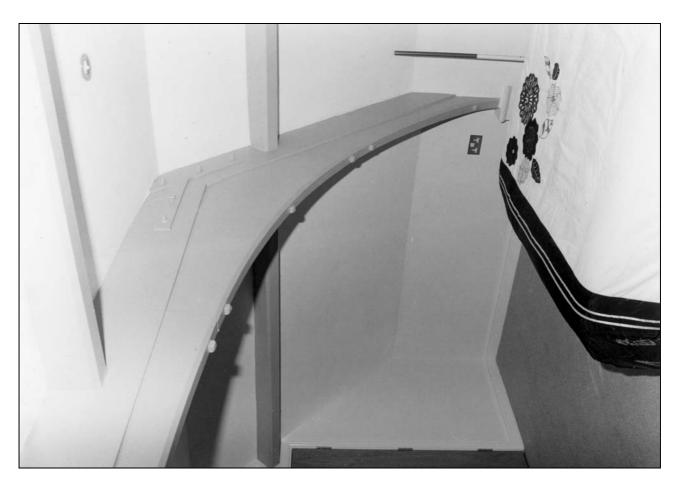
Part of exposed roof truss over south wing (film 4, frame 5)
